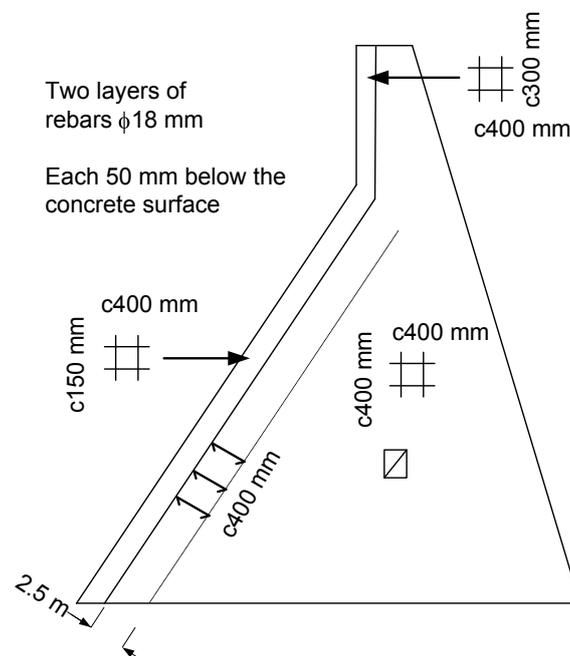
Arrangement of steel reinforcement in the analysed concrete monolith.
